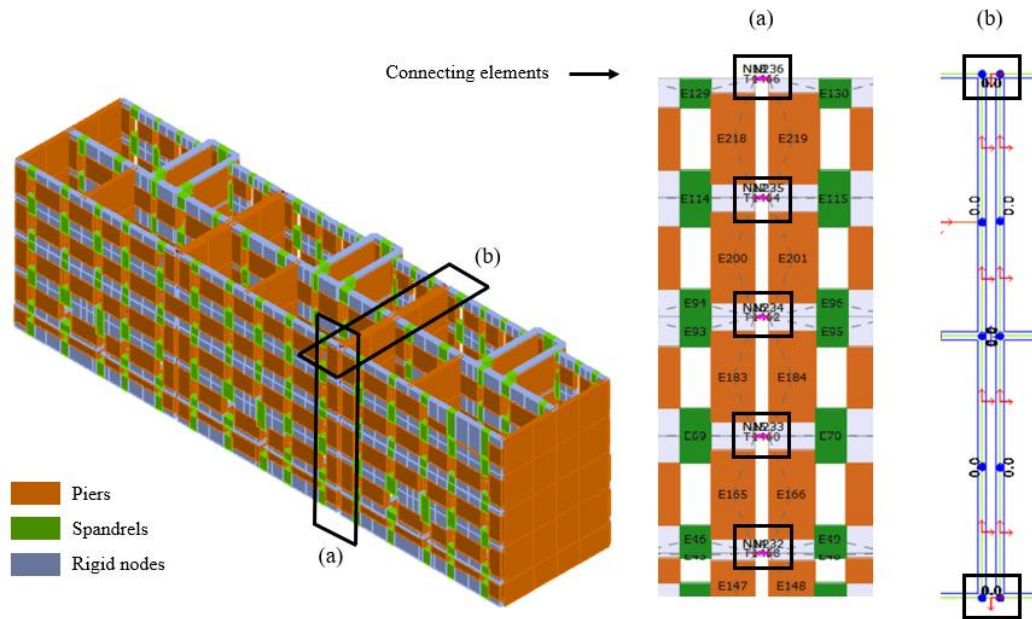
(a) Tremuri model of the aggregate configuration - (b) detail of the model elevation at the connection between two adjacent structural units and detail of the elastic truss elements with null tensile behavior and of the fictitious floor connecting two adjacent units.
